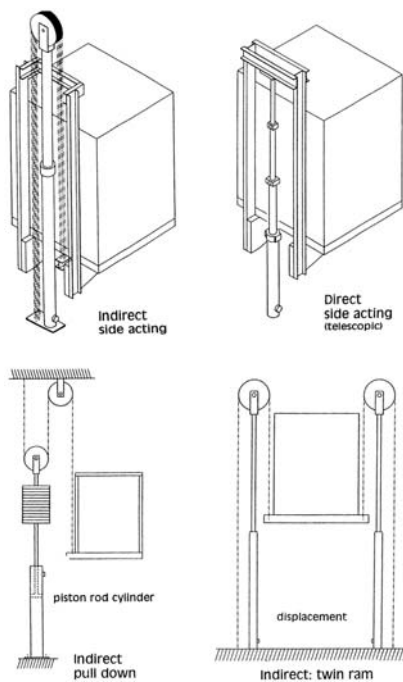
Hydraulic elevator arrangements – schematic drawing.
